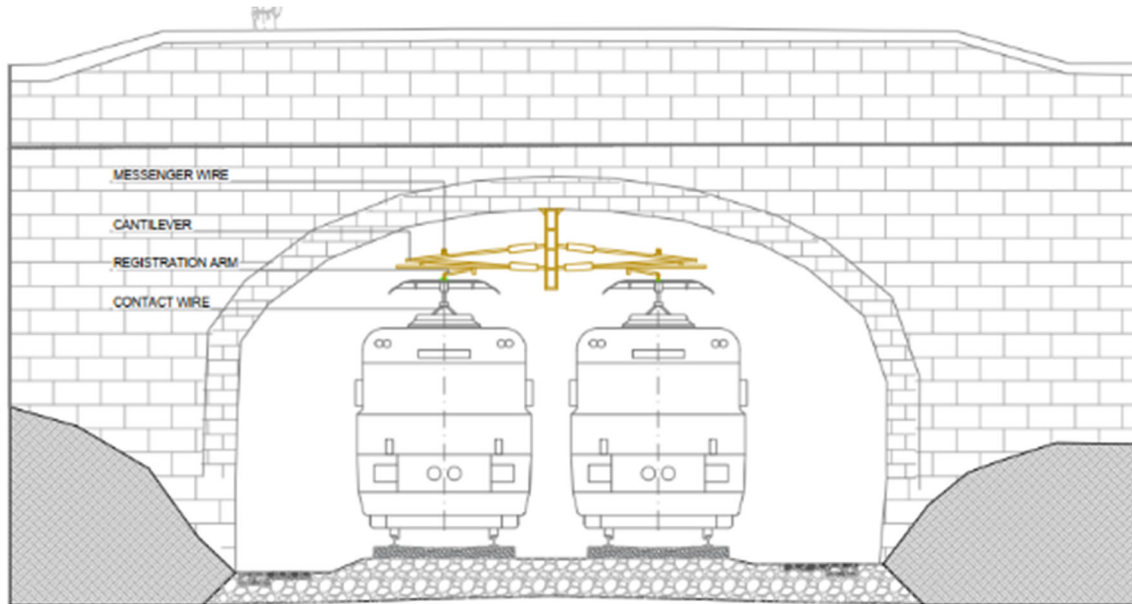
Typical OHLE Tunnel Cantilever Arrangement
